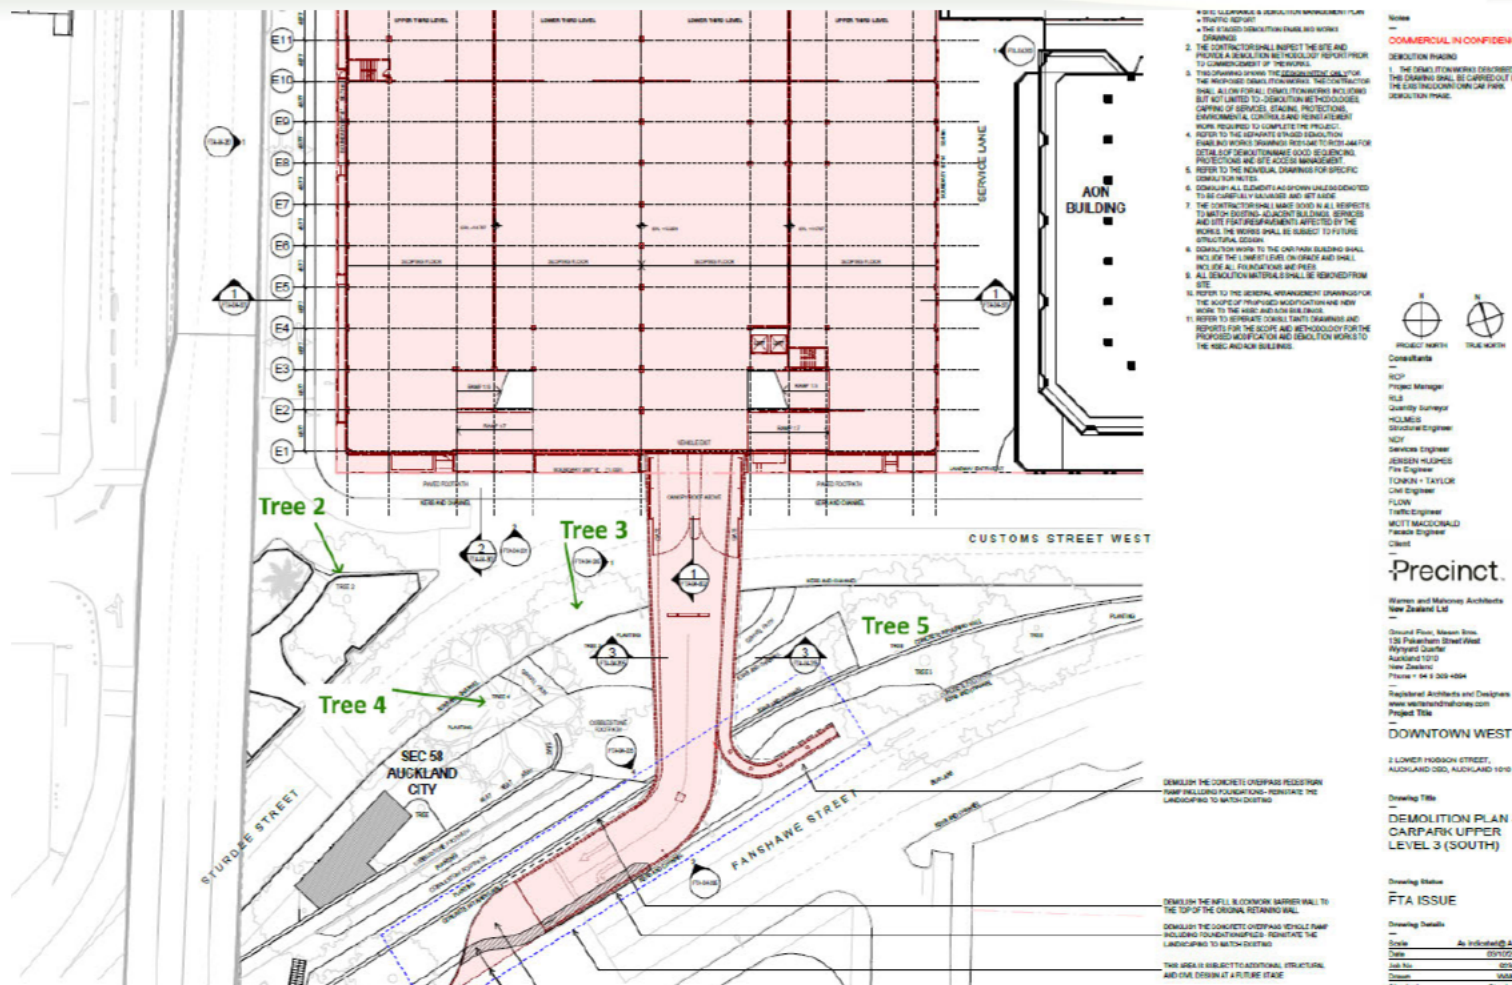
Tree Location Plan (Page 2 on Demo Plan set)
